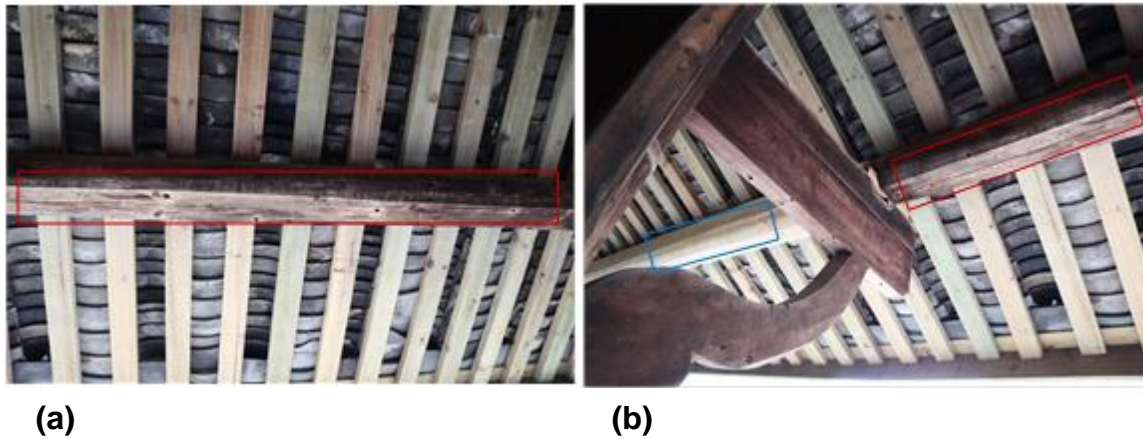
Photos of eave purlin in ancient wooden structures; (a) The Eave purlin before replacement; (b) A purlin component has been replaced
